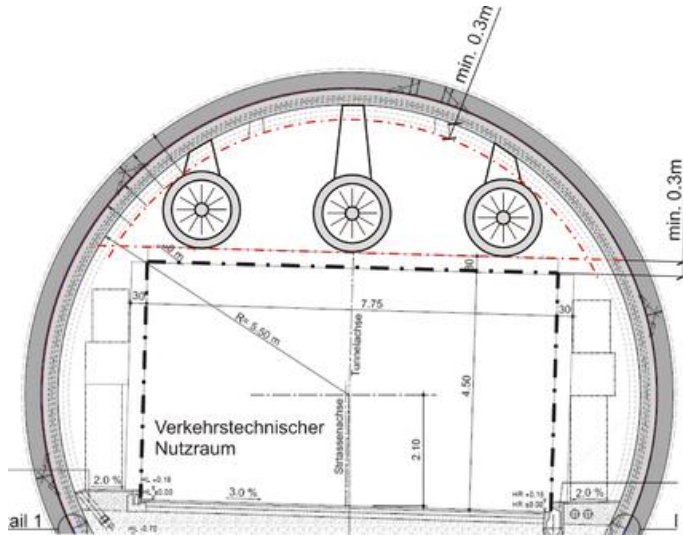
Example of jet fan installation distances to tunnel wall and traffic envelope.
